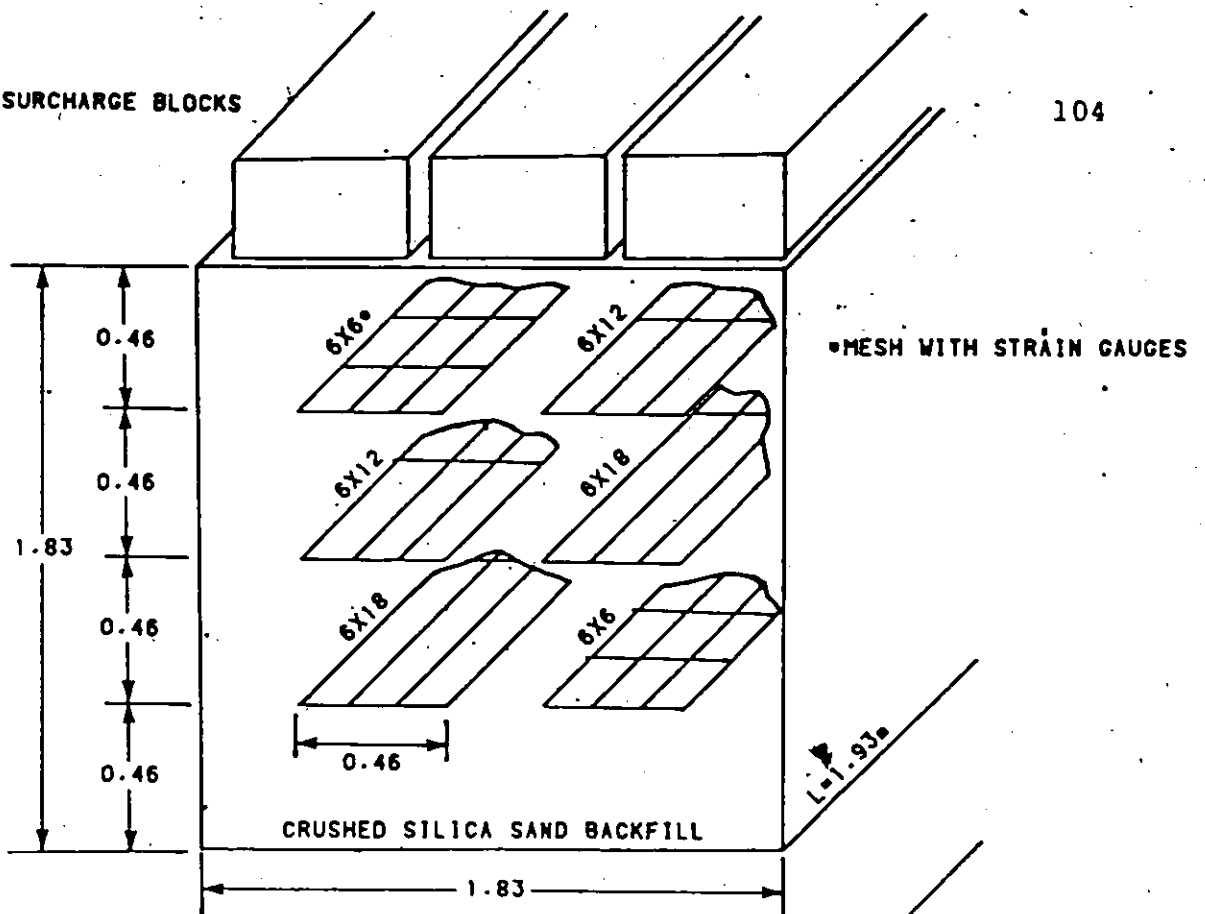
ELEVATION VIEW OF PULLOUT TEST SET-UP
